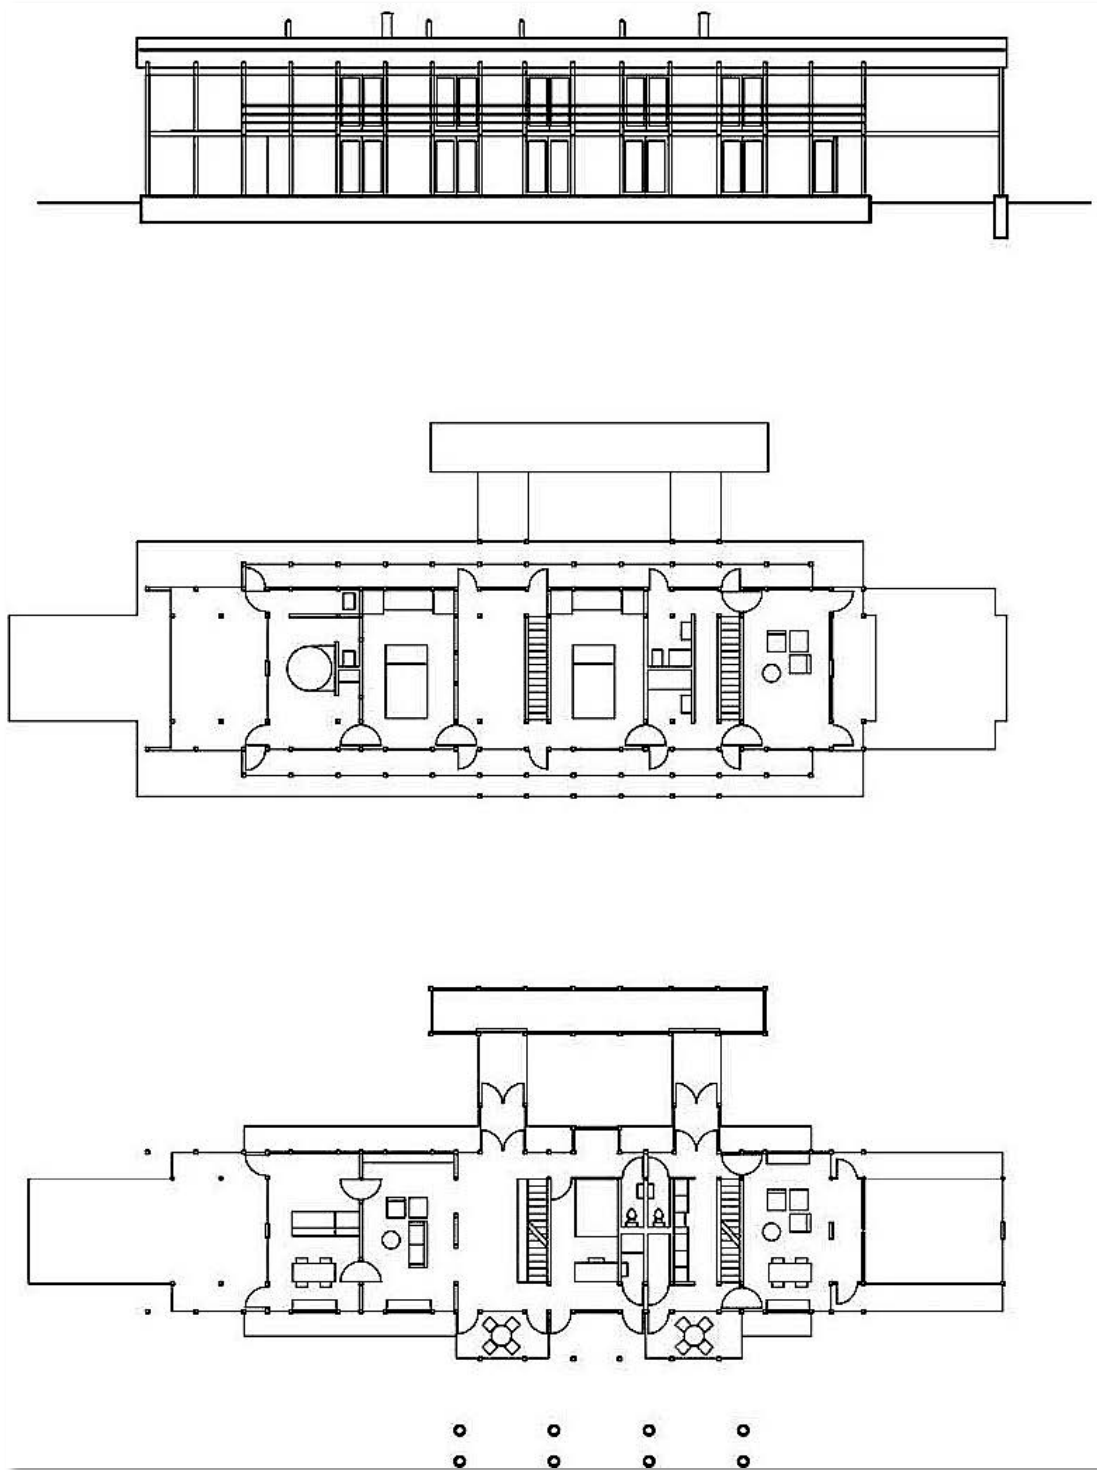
Two-family House, Pullach, South elevation with corresponding plans
